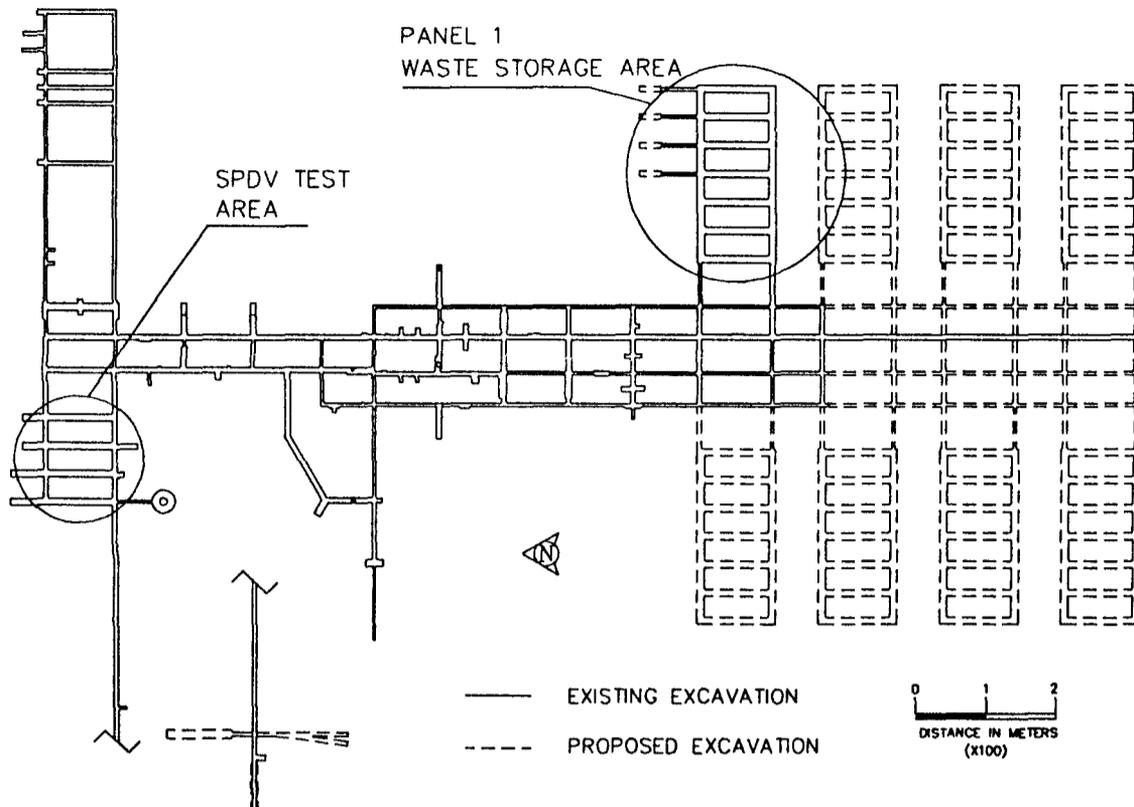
Waste Isolation Pilot Plant (WIPP) Mine Plan
